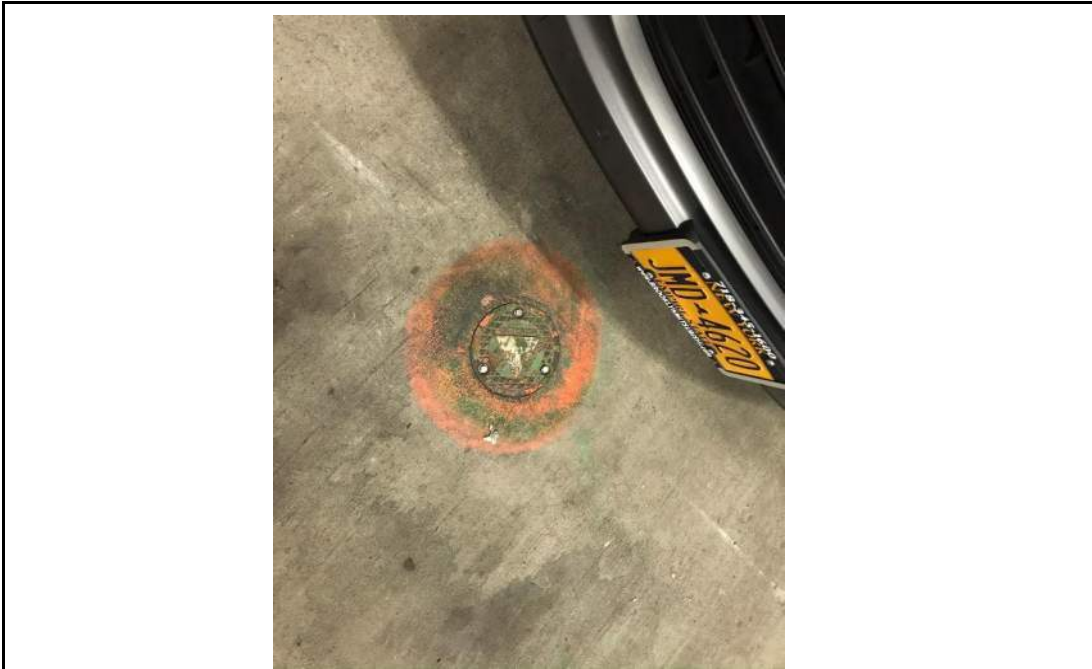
Groundwater monitoring well (PMW-3) within subgrade parking area, facing north. 6 February 2020.
